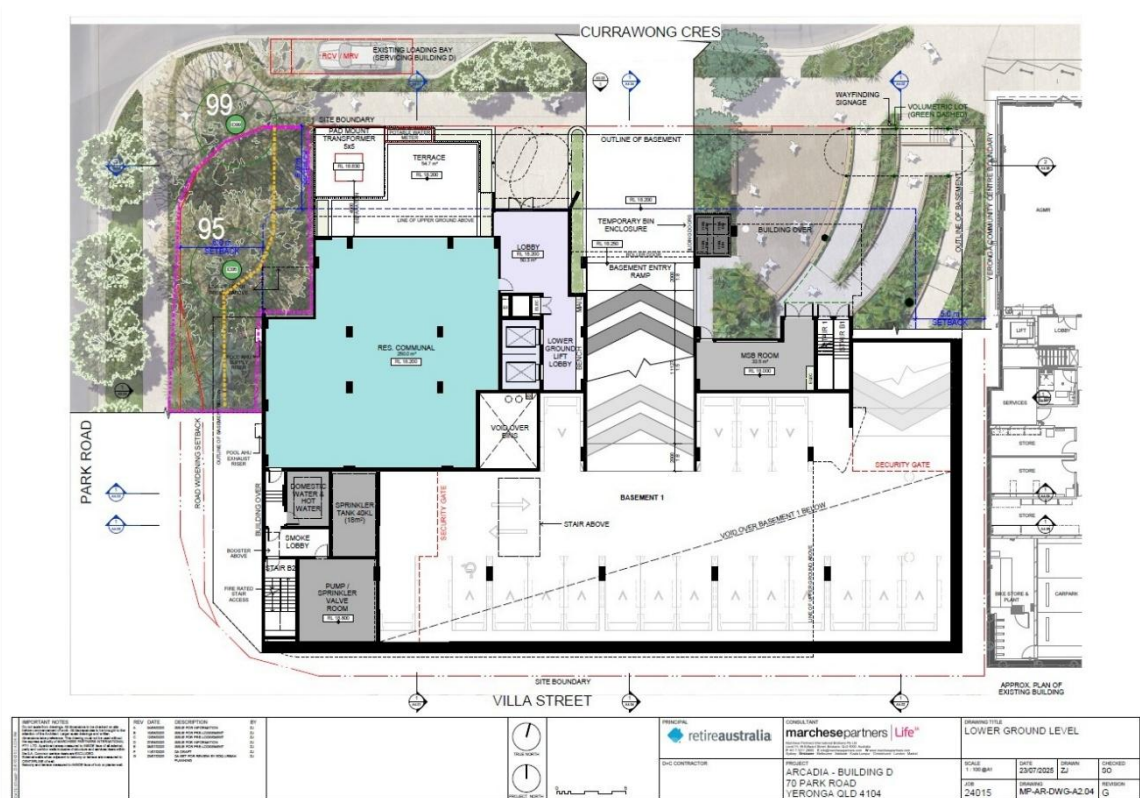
Marchese Parktners Lower Ground Level plan, with subject trees 95 and 99
